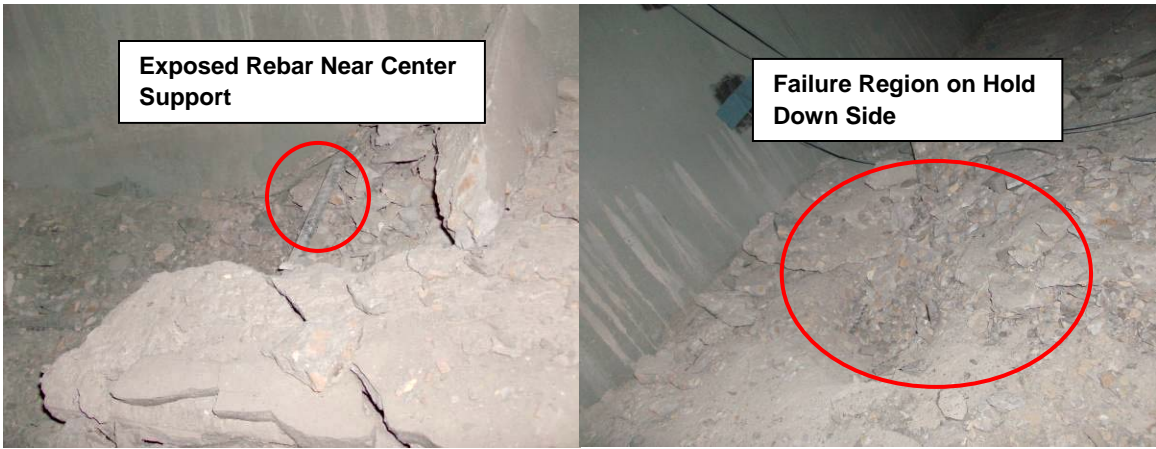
Failed Bottom Concrete Slab on Hold Down Side
